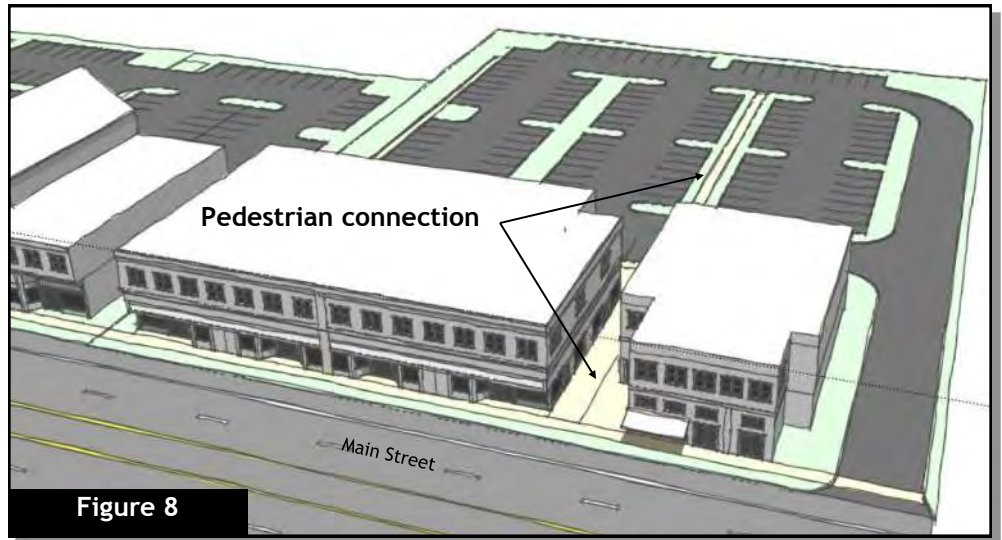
depicts a single, large property on which two structures are built, each sharing a parking area in the rear. This concept also provides a common pedestrian network and plaza space that connects each building entry with the common parking lot and the street.
